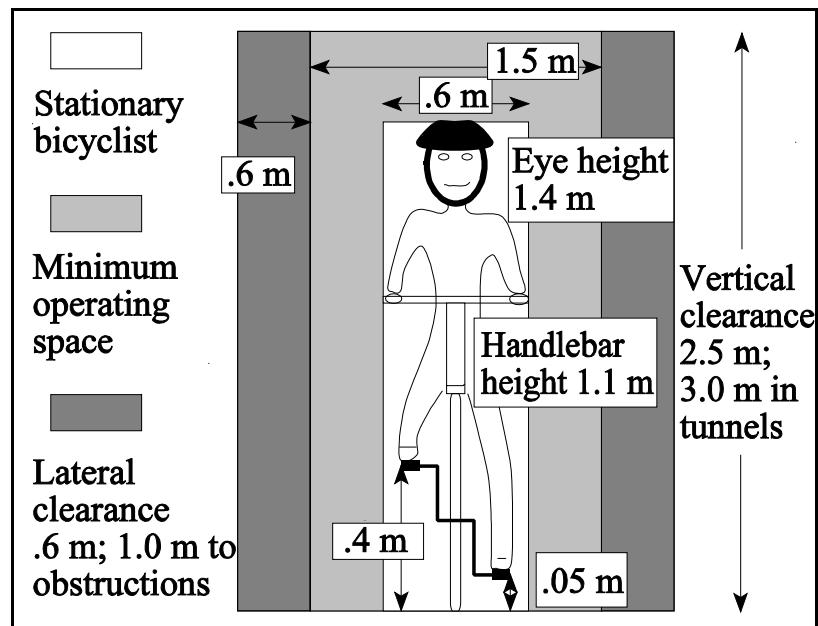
Design bicyclist dimensions. (1 m = 3.28 ft)
